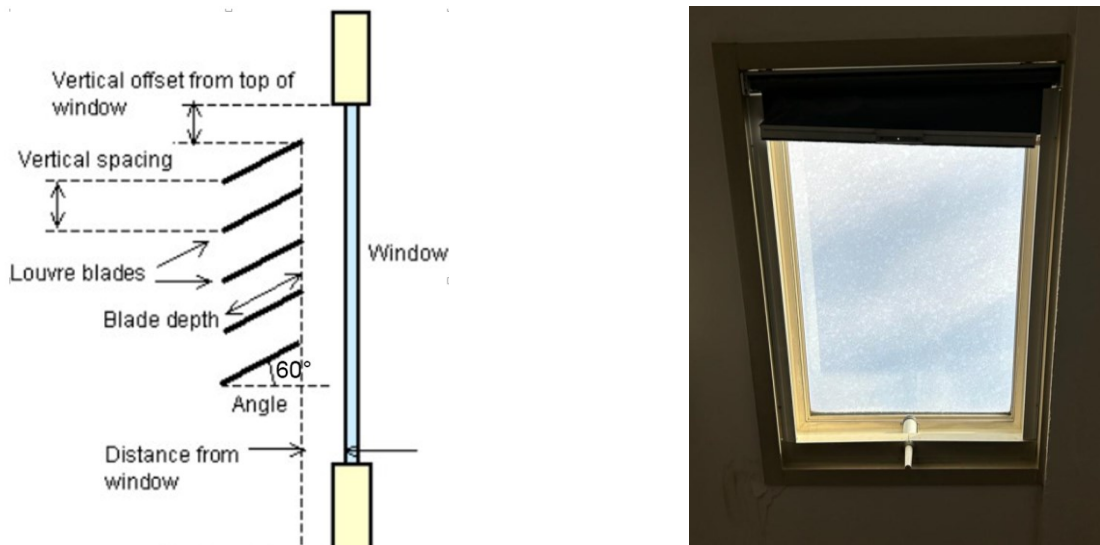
Current shading of 3rd floor rooms from D-10 to D-13 (Design Builder) and skylight shading from room E-14
